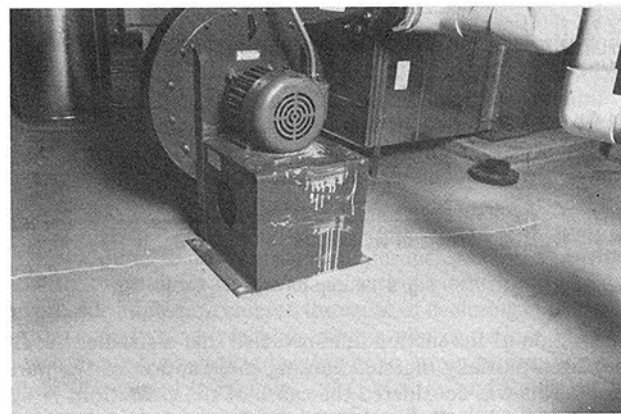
End view of New York blower and its support base. Note propagation of cracks in concrete floor from under the blower's support base.
